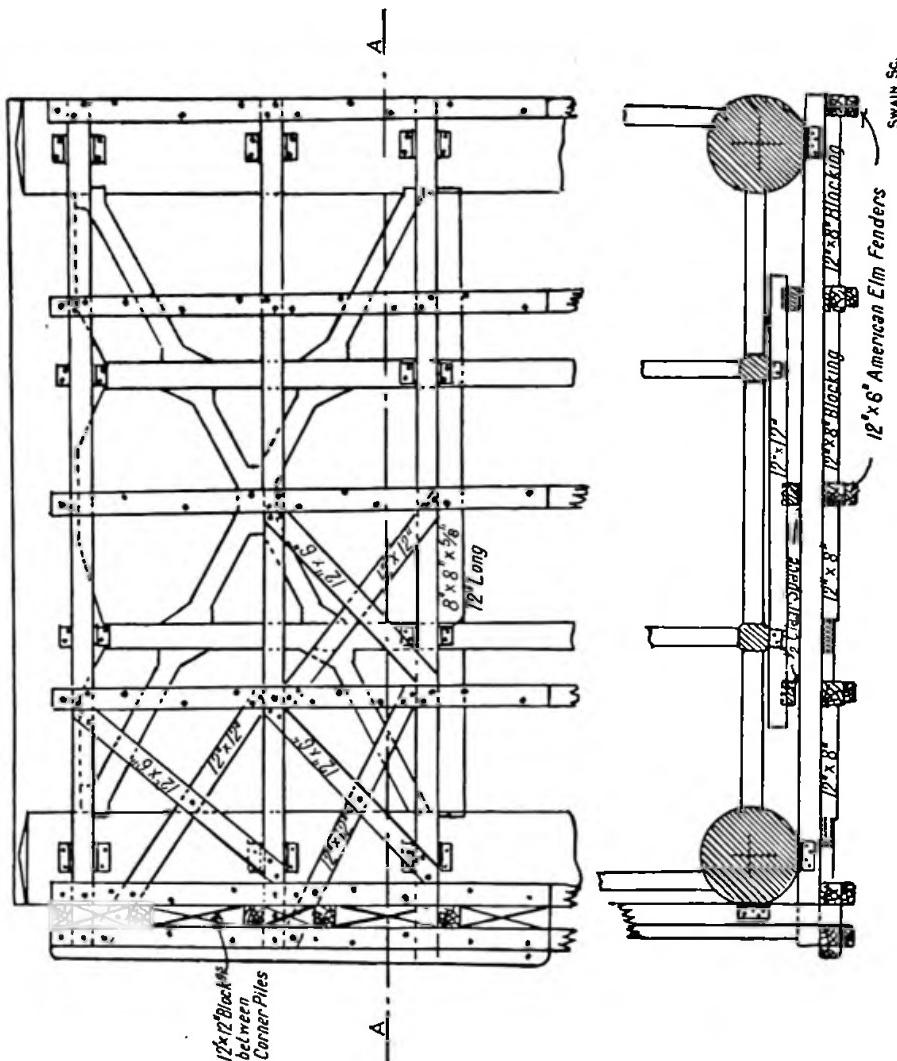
Fendering for Reinforced Concrete Jetty, Gravesend.
